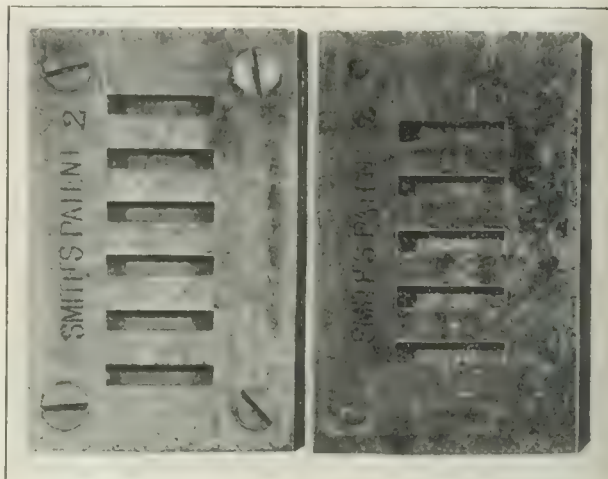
Views of Both Sides of a Section of Double Wall Casing with Staggered Perforations, and a Slight Space Between Plates to Give the Screening Apertures.
